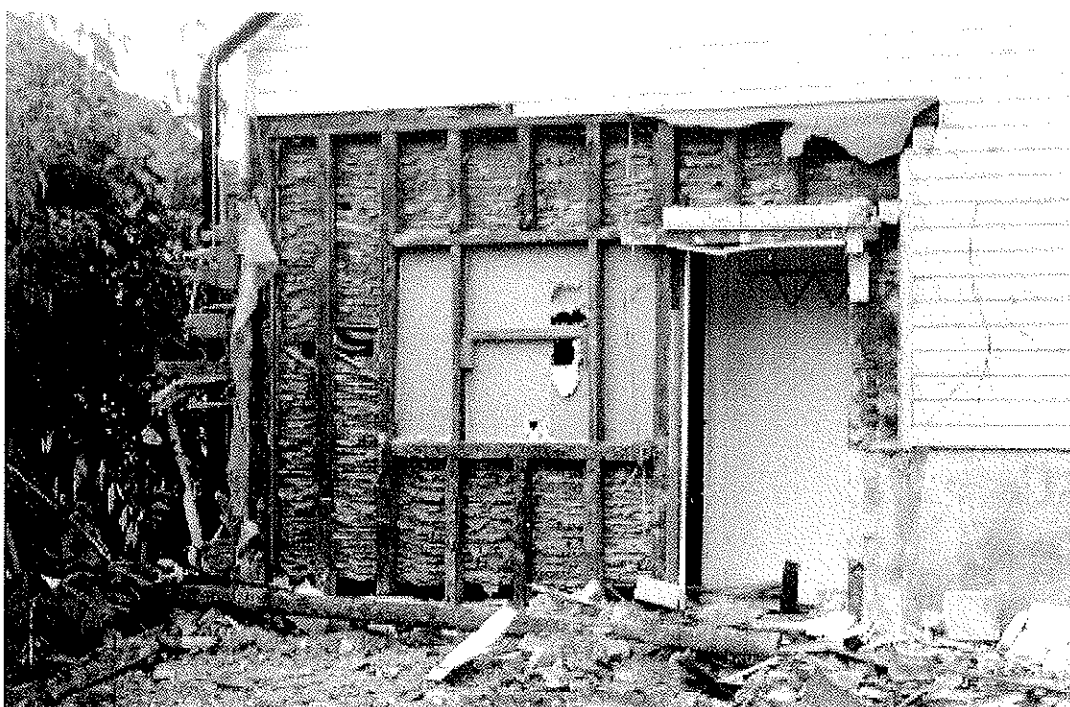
East elevation: Timber framing exposed during demolition, note original window and door openings
